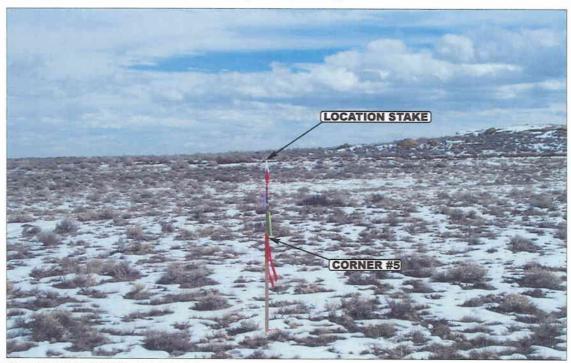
PHOTO: VIEW FROM CORNER #5 TO LOCATION STAKE
